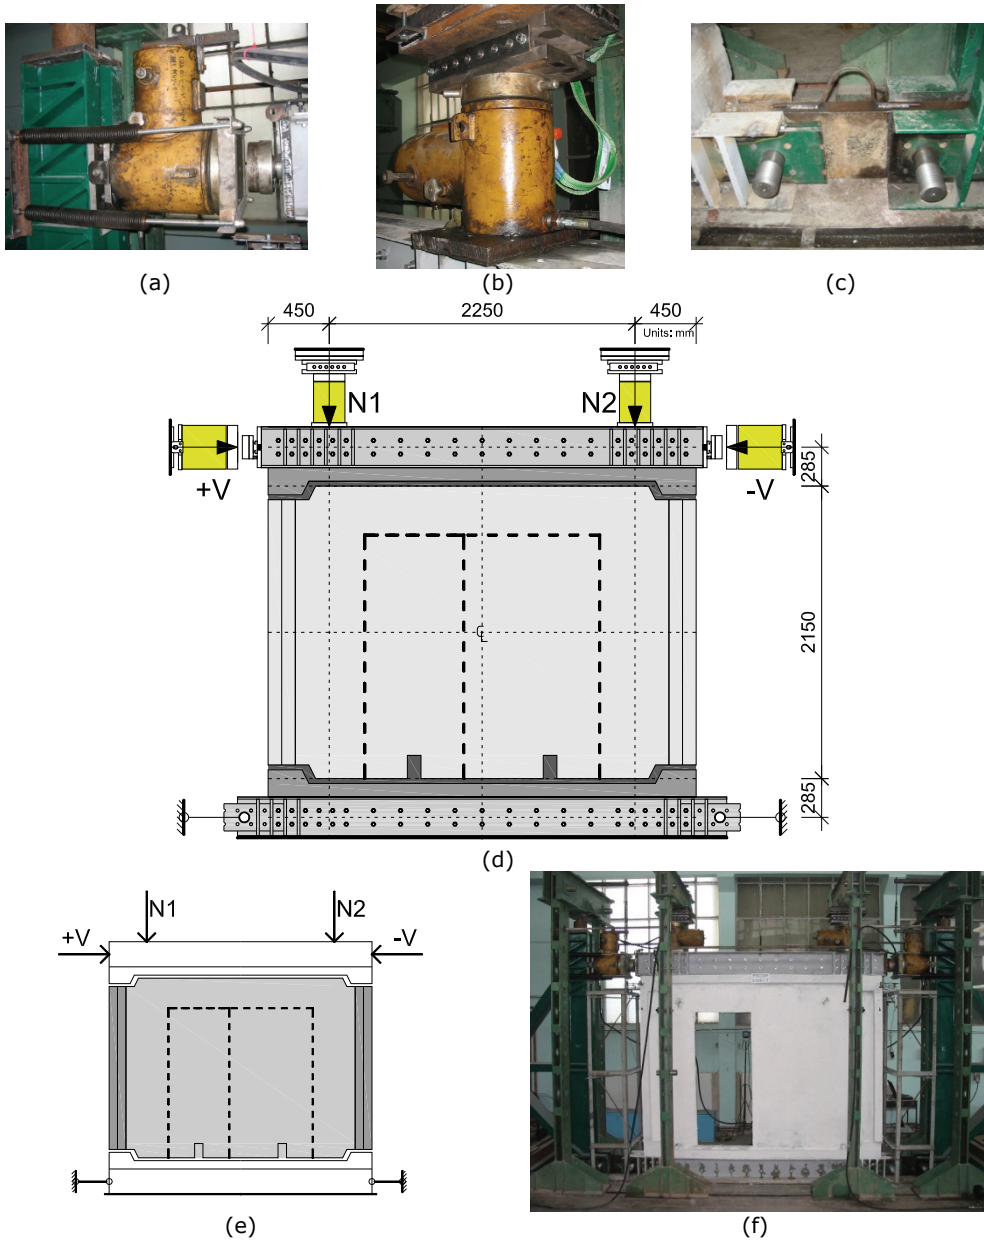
Arrangement of the loading devices: (a) horizontal loading hydraulic cylinder; (b) vertical loading hydraulic cylinder; (c) hinged connection at the base; (d) loading configuration; (e) schematic loading; (f) specimen 3-S/E1-T.
